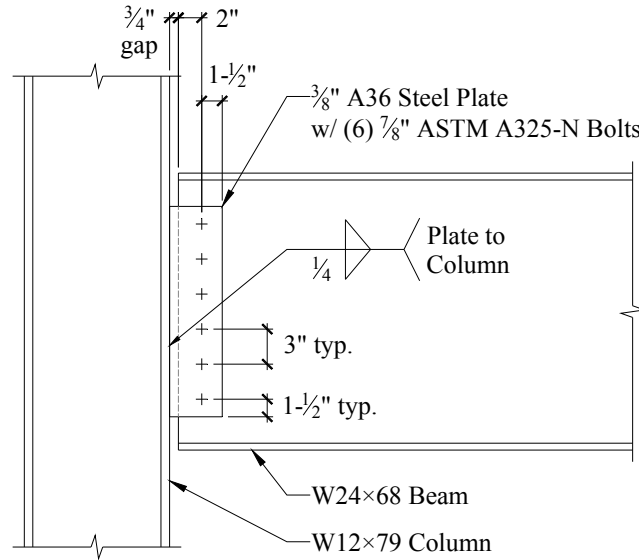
Typical shear-tab connection detail for gravity framing system of prototype building
